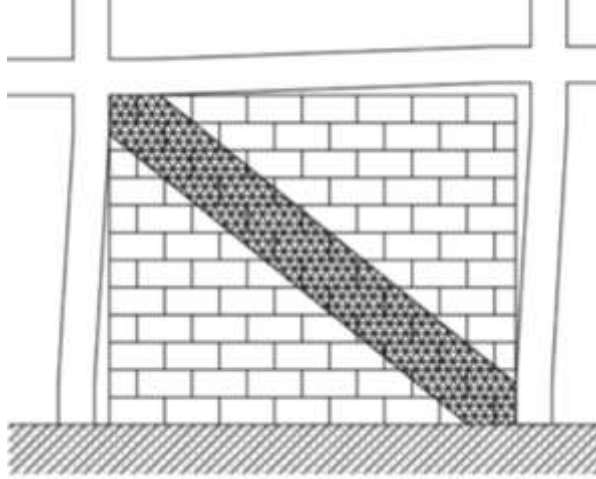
Visualization of masonry compression strut (Image credit: Structure Magazine)
